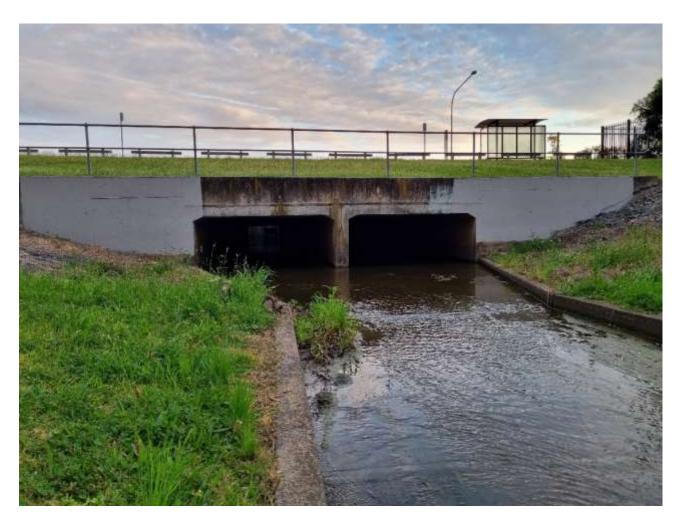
Photo downstream of Glenwood Lake showing two 3.0m wide x 1.2m high box culverts from outlet structure, discharging into an open culvert (adjacent Parklea Public School)
